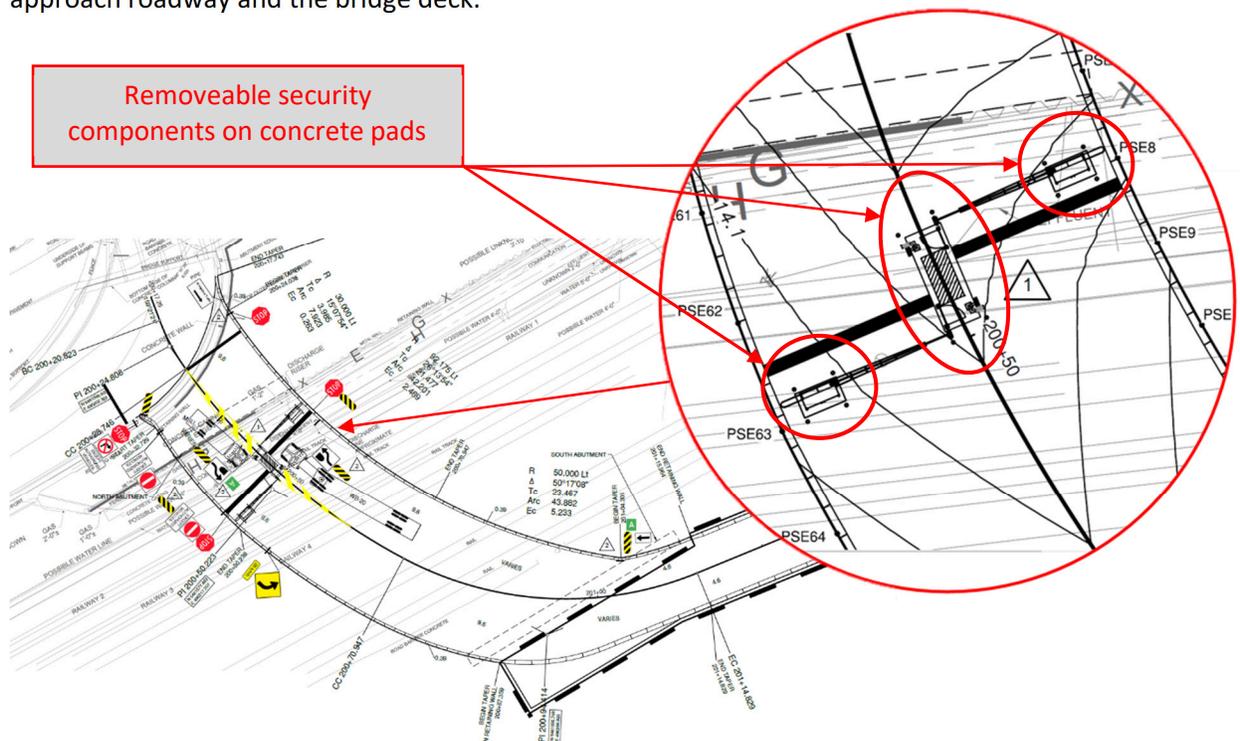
Access to the settlement pond at north abutment of the bridge
